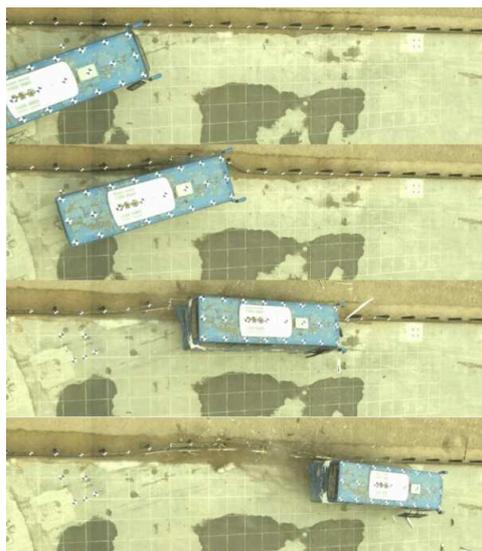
Full-scale Impact Test With Real Vehicle on Steel Backing Wood Landscape Guardrail
